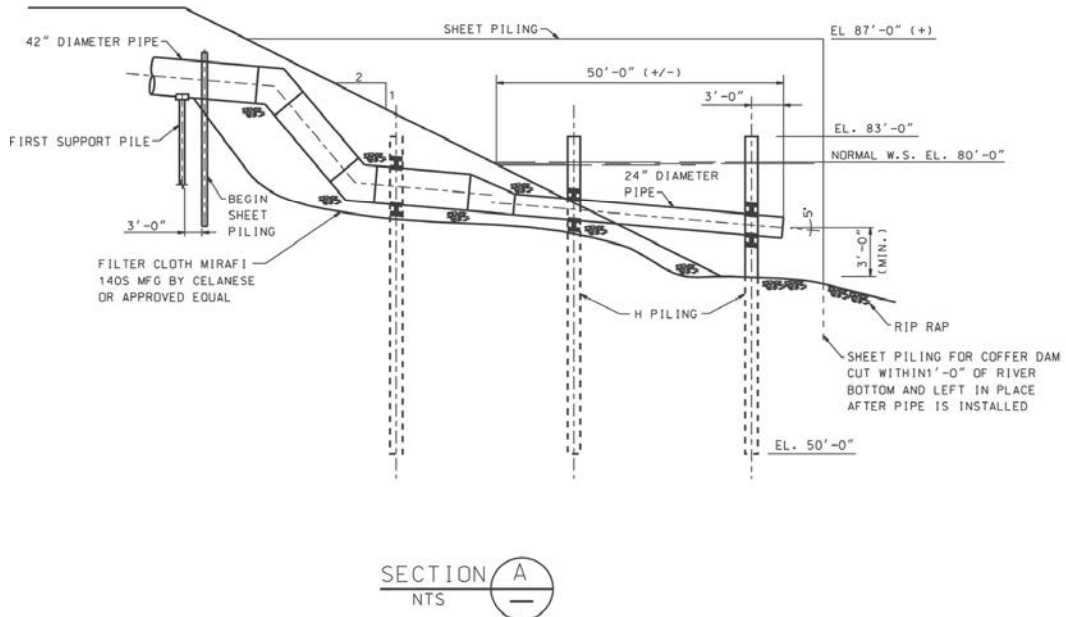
Section View of Proposed Discharge Outfall (Southern 2007a)
